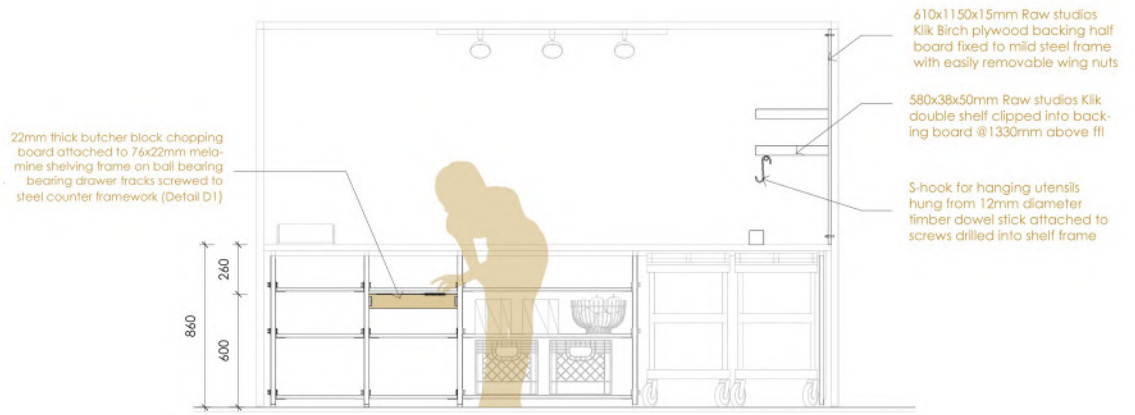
Plan showing Mama Fatima's stall with additional elements (not to scale)
